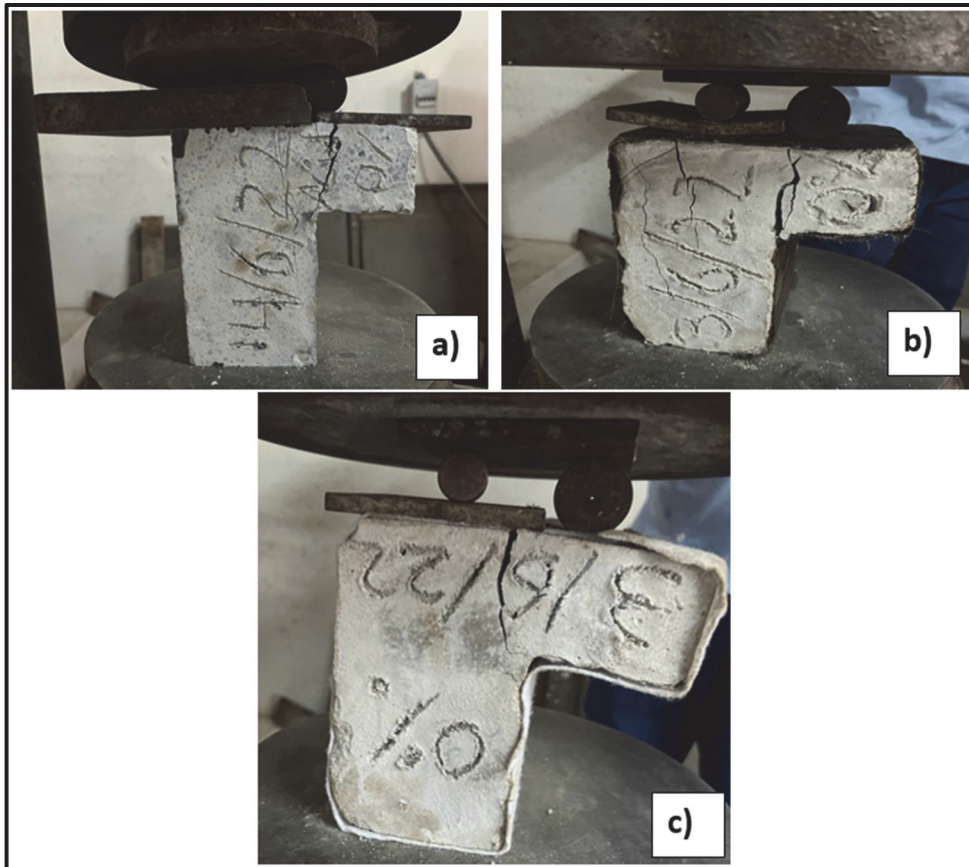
Cracked concrete samples under Shear Test (a) Plain Concrete (b) BFM wrapped and (c) GFM wrapped samples.
